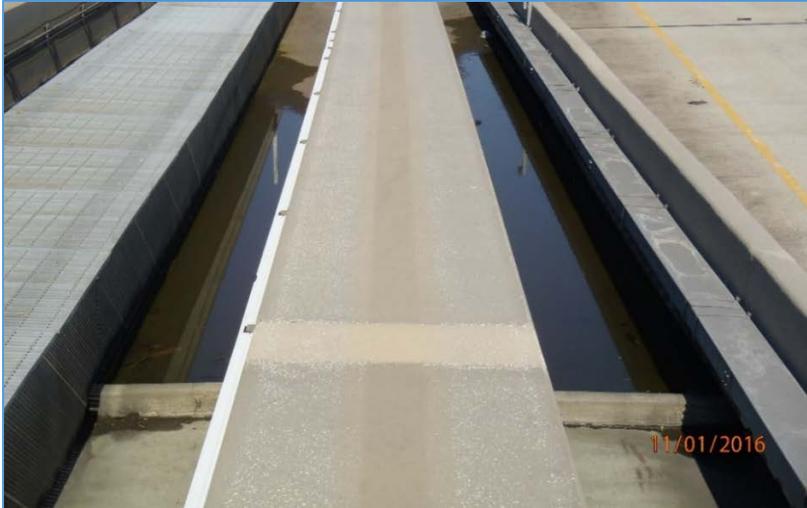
DRAINAGE BARRIERS (WEIRS)
